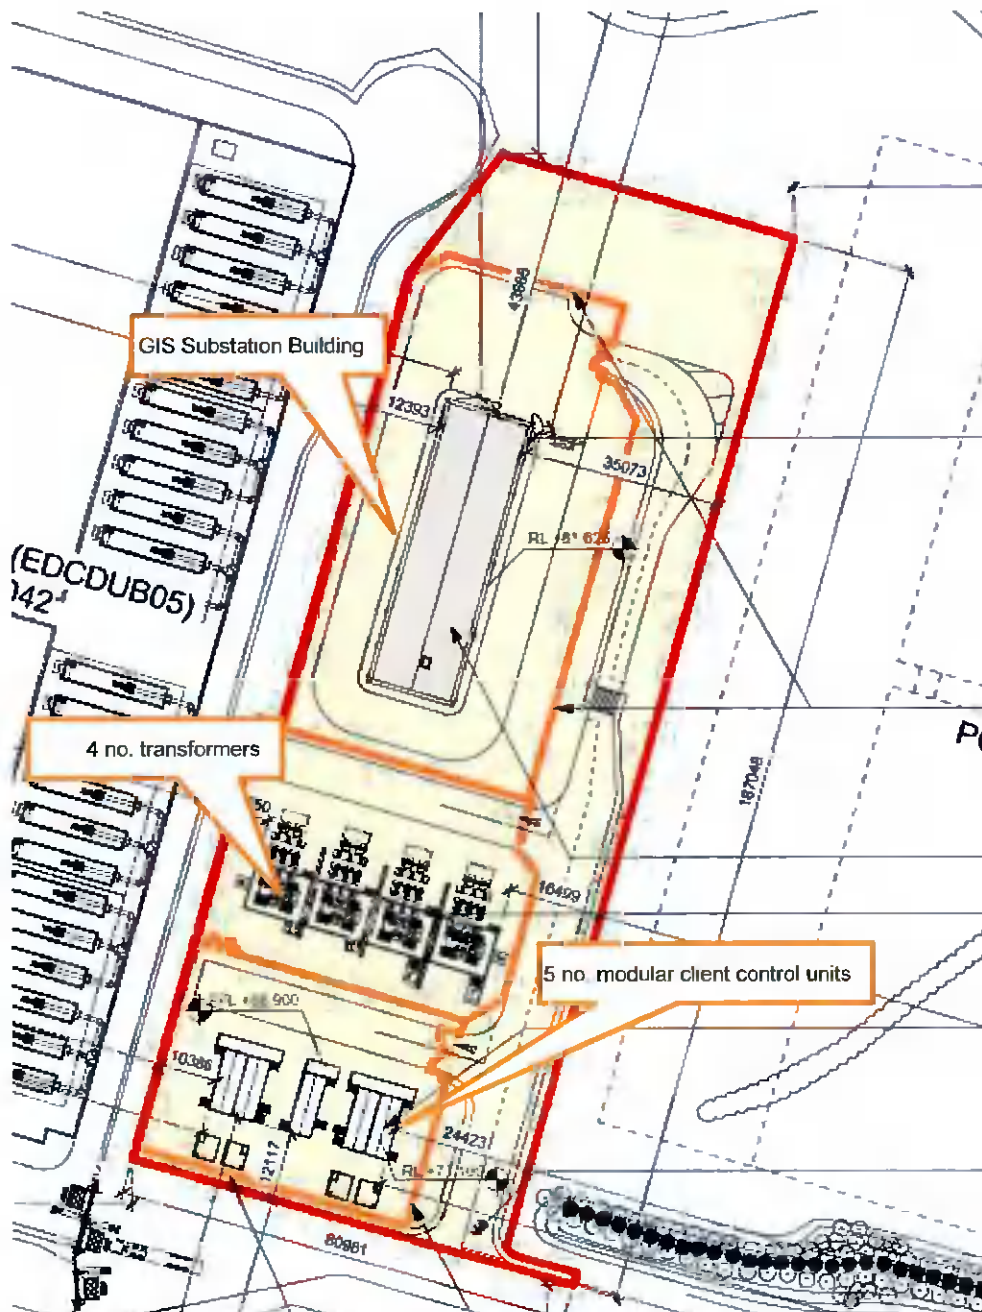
Extract from HJL Proposed Site Layout Plan illustrating the proposed amendments
